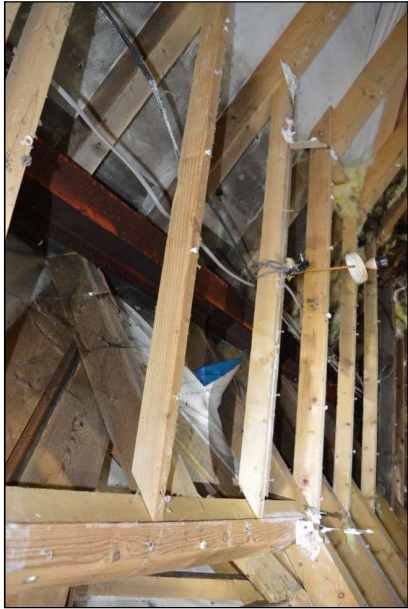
Steel beam forming ridge line in bedroom 1 (CPAT 4900-0049)
